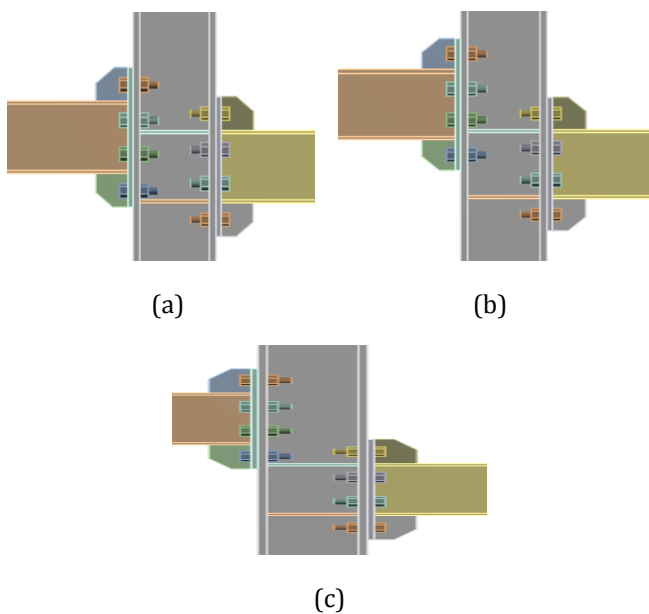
Models (a) VH 80 beam -IJS (b) VH 170 beam -IJS (c) VH 270 beam -IJS
